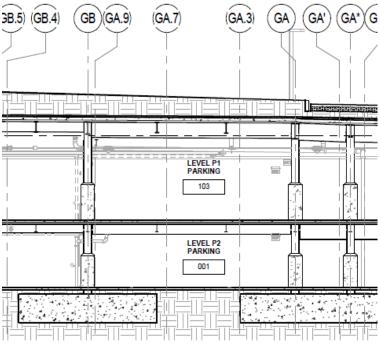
Partial Elevation in Architectural Drawings, (Gateway)
